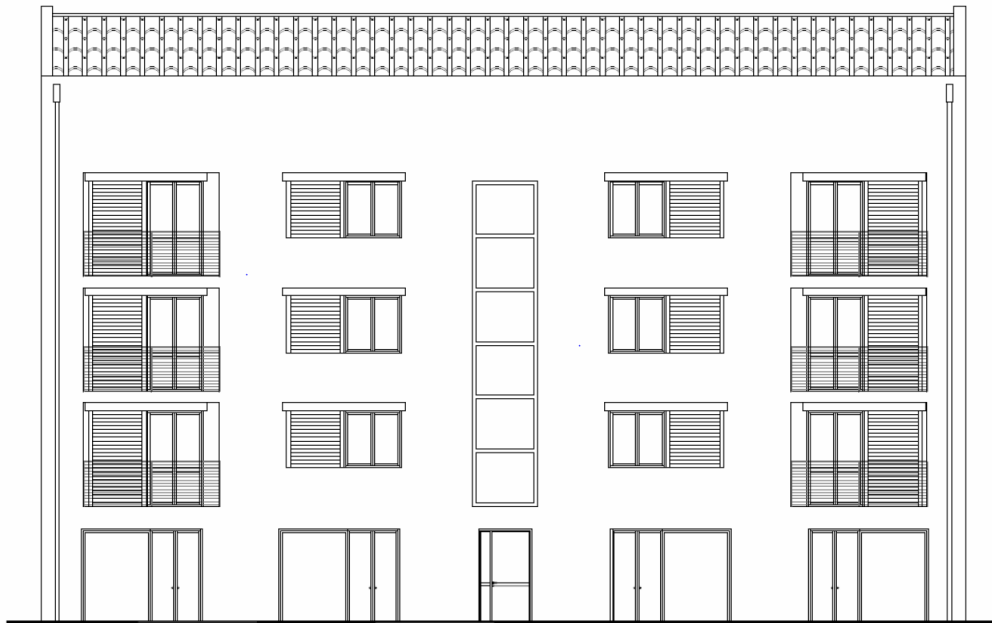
Main facade of the reference building for construction cost assessment by ISTAT [5].
